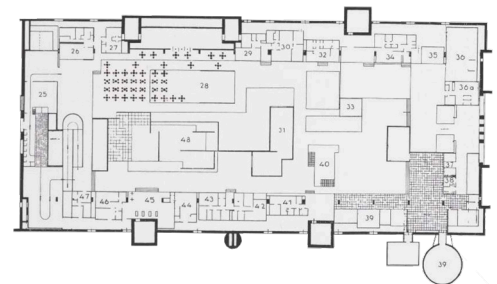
Floorplan Hall 2 ground floor. From "The Museum of Modern Art," by M. McQuaid, 1996.
